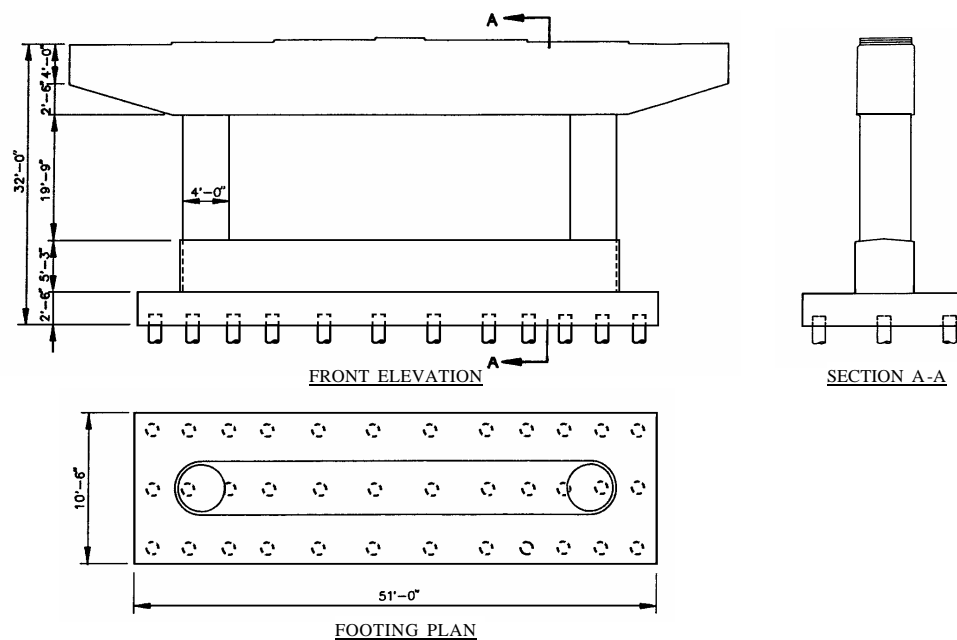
Typical Piers for the Approach Structure (Pier 2).
